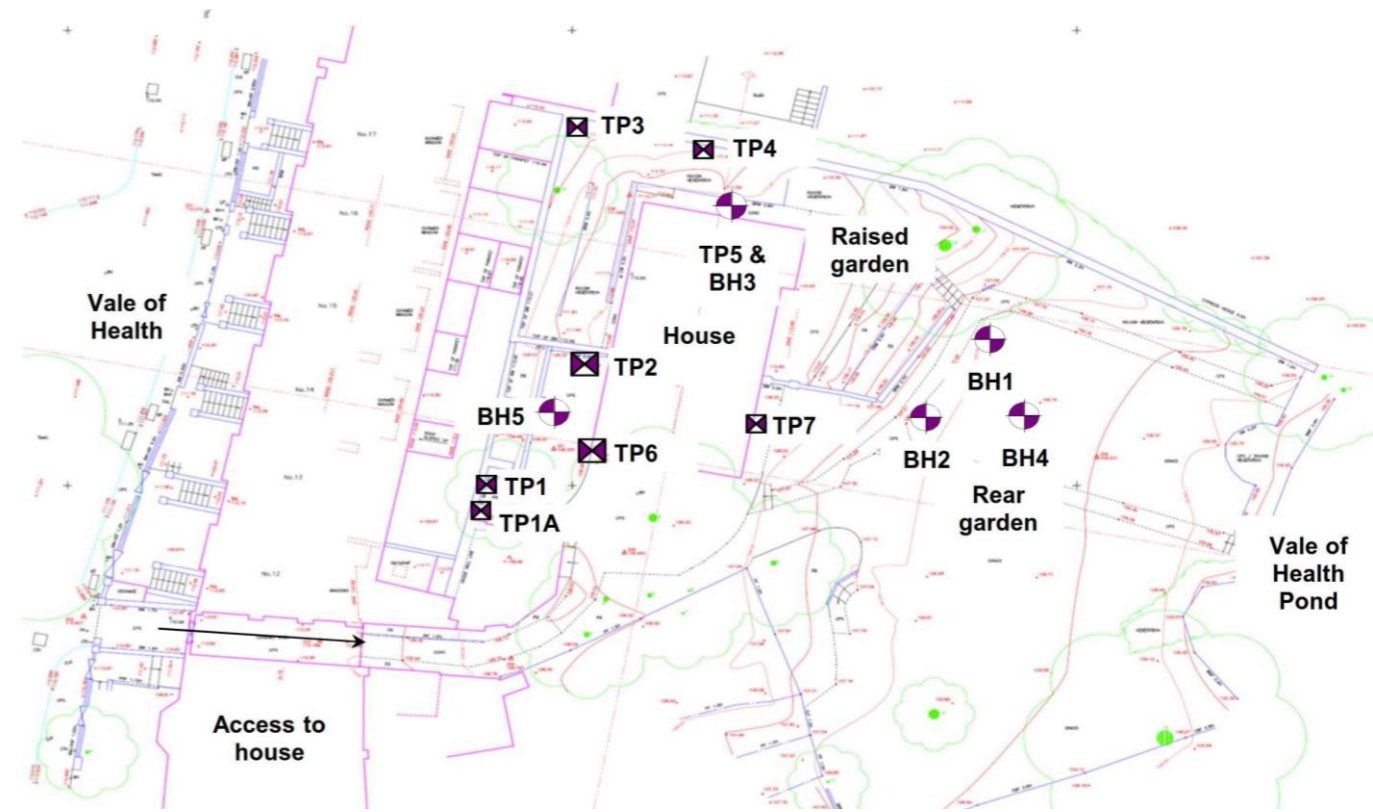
Site Investigation Plan - GEA, up to and including site works in September 2017
